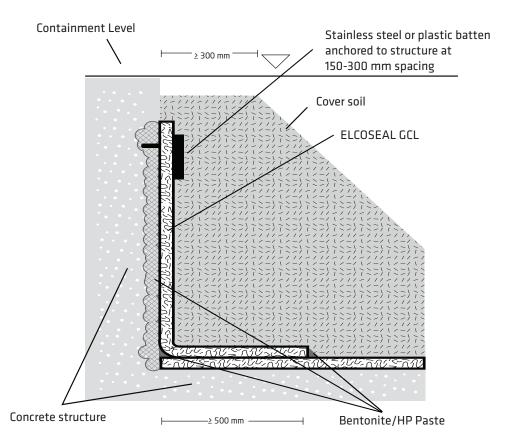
Typical connection to a concrete structure where the ELCOSEAL panel if required to extend above the maximum containment level
